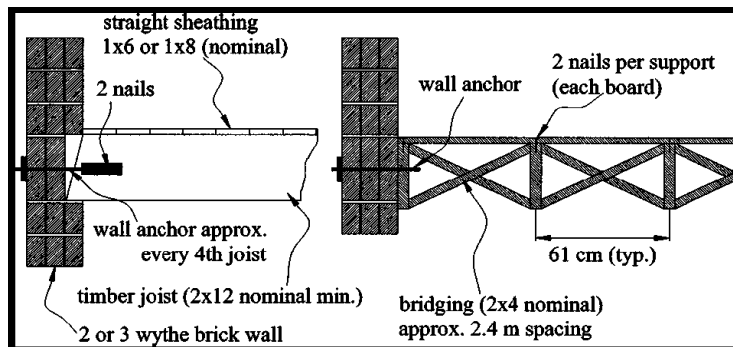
Typical floor connection details in pre-1950s URM buildings in US (reproduced from [25])
